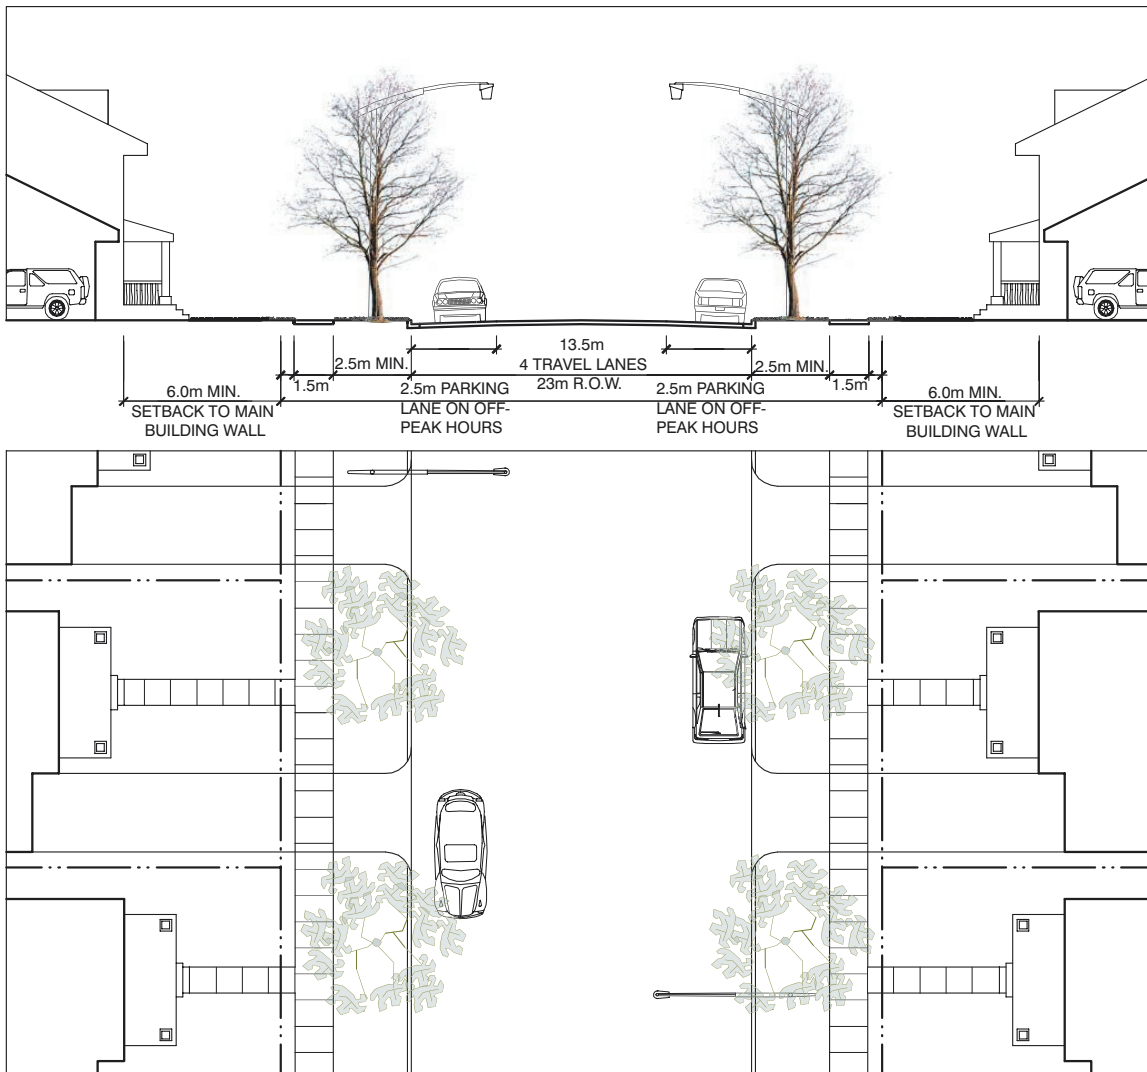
Plan and section views show residential interface with arterial/collector road that allows for street trees planted in boulevards, sidewalks and two off-hour parking lanes.
